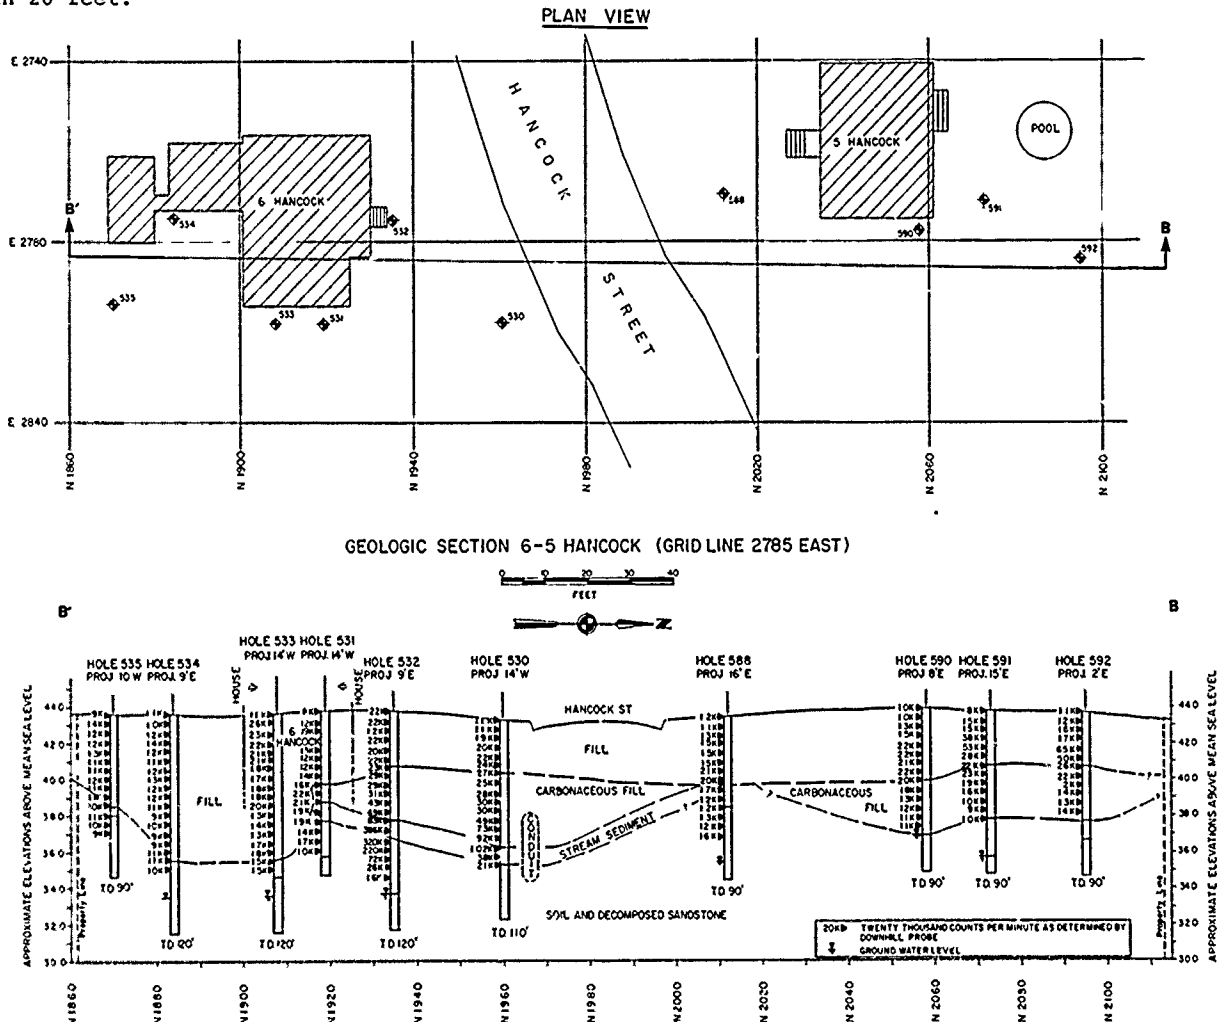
FIGURE II - PLAN VIEW AND CROSS SECTION OF 6-5 HANCOCK STREET
